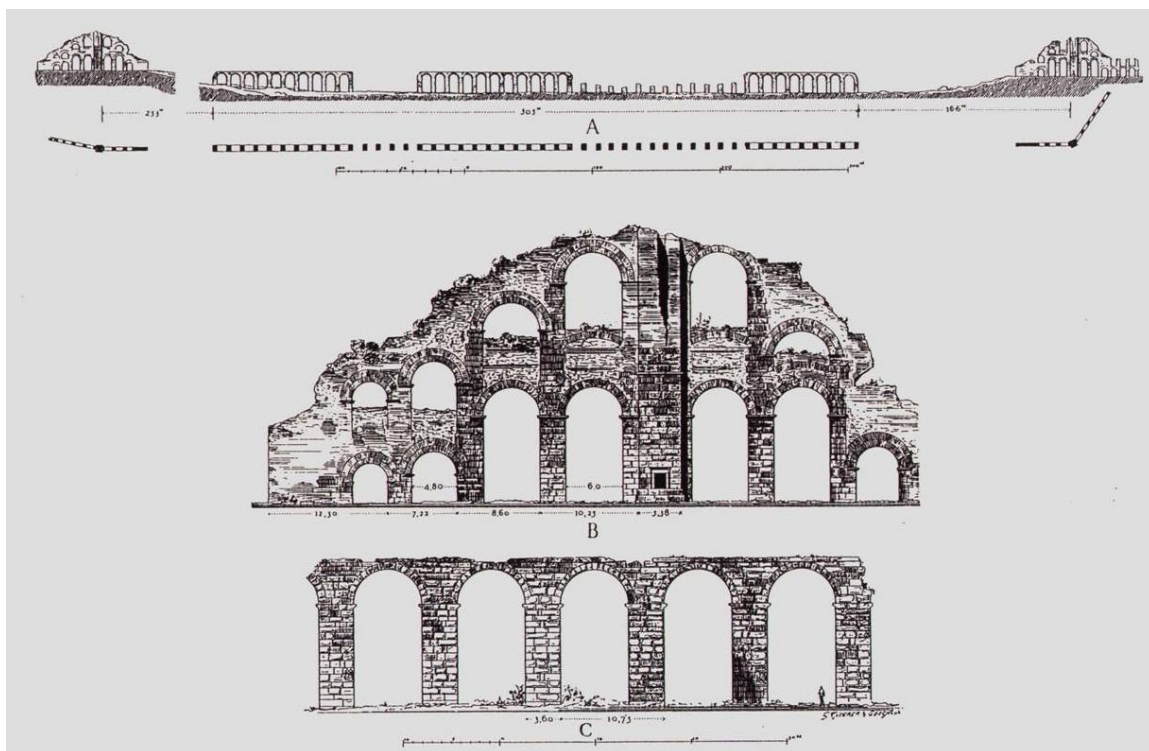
Plan and Elevation of Central Aqueduct Section and North Tower (Lanckoronski 1890)
